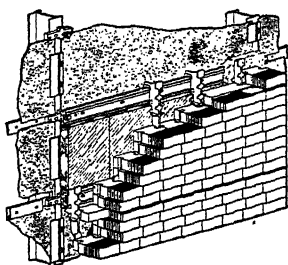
Insulated wall in which cast-iron horizontal supports are fastened to vertical columns.
